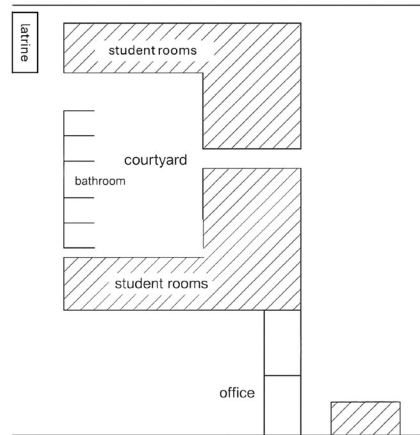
Layout of Zion Student Hostel: A Reconstructed Plan.
